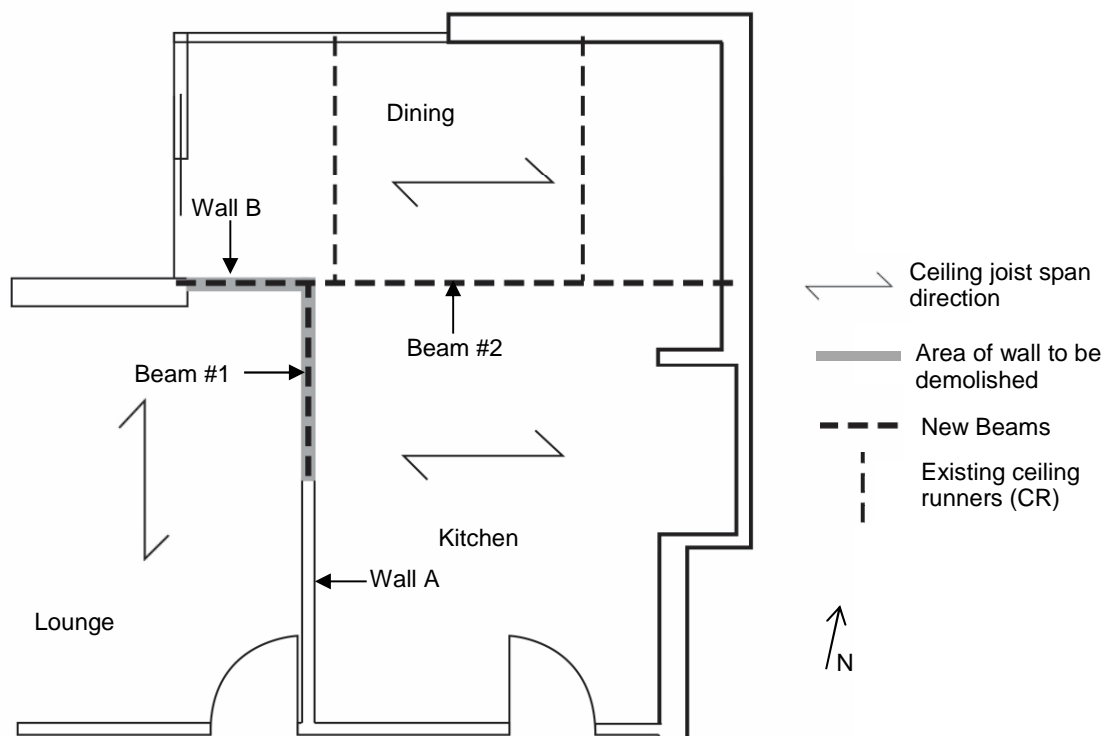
Drawing showing proposed demolition and new beams (not to scale)
